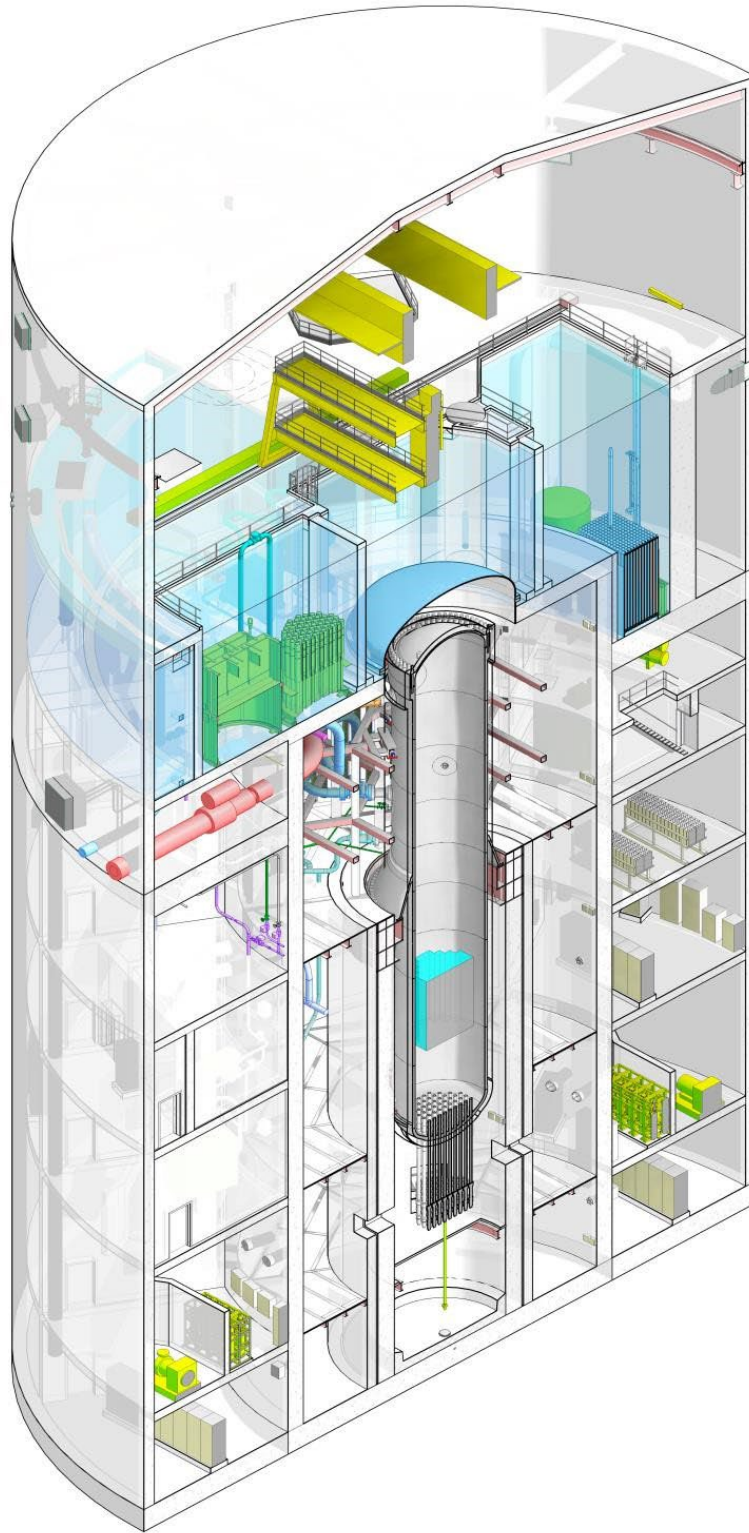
General Containment Arrangement – Reactor Building Section View
